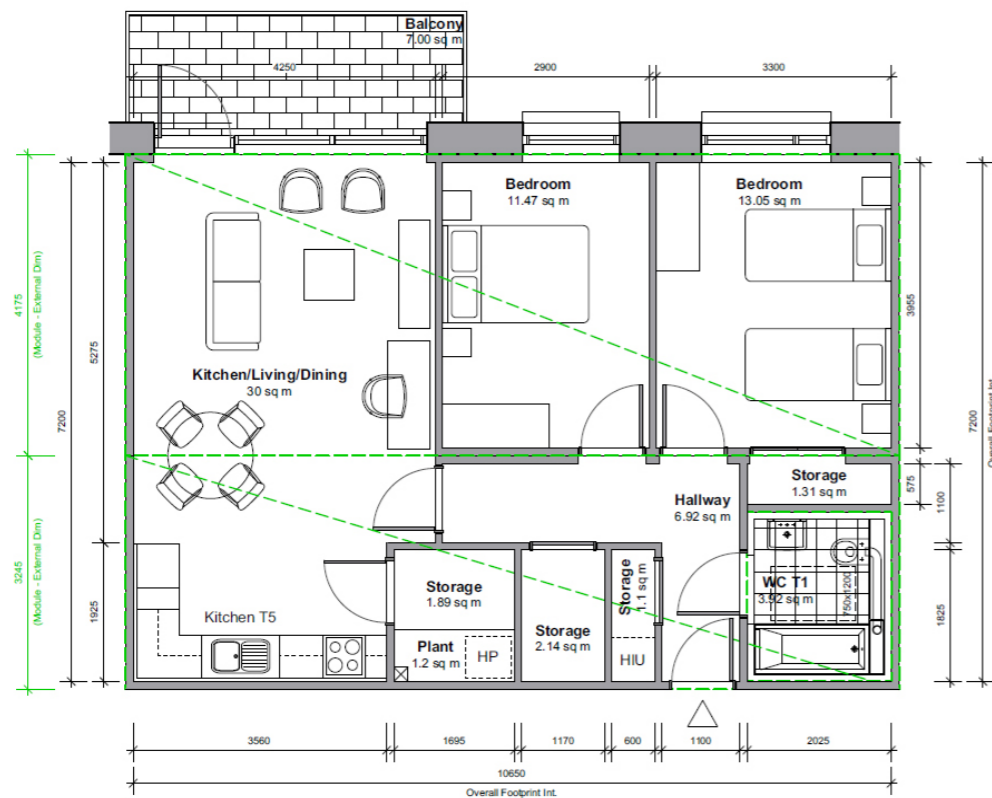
Two Bedroom Apartment Layout- Apartment Type A-2B4P-1
